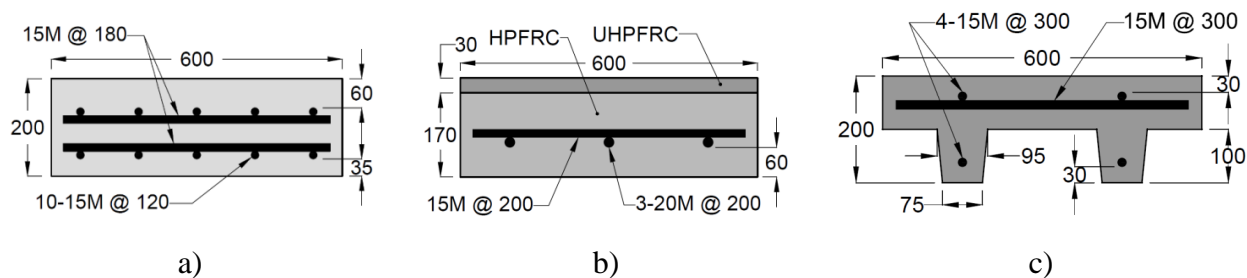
Slab specimens cross-section: a) HPC; b) hybrid; c) UHPFRC (Note: all dimensions in mm. 1 mm = 0.039 in)
